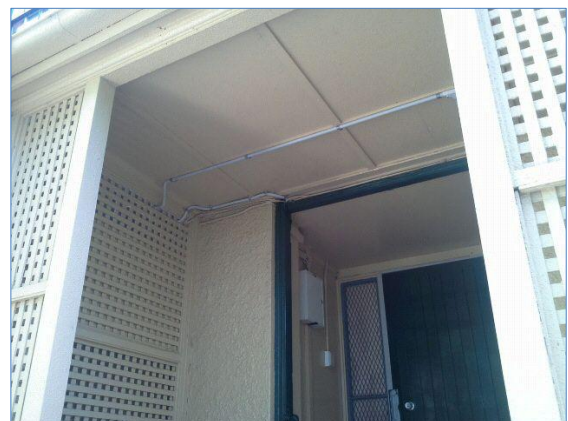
External perimeter - Cream paint to walls and green paint to doors, frames and windows
